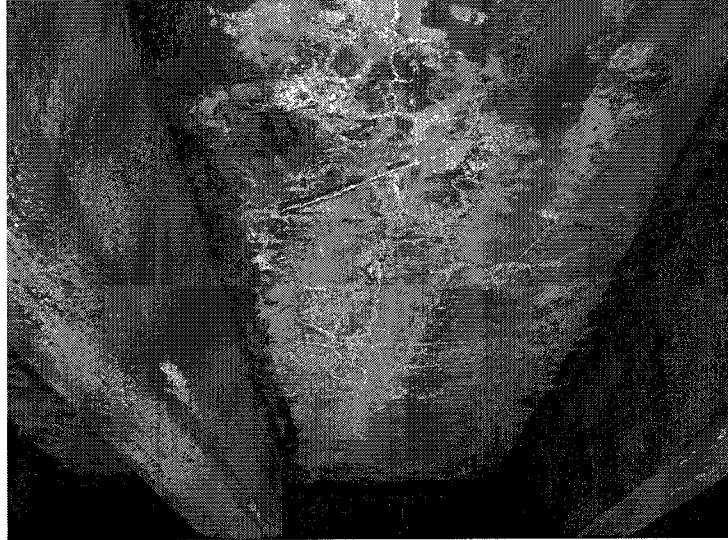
Span 1, Bay #5; Cracking in deck soffit is heavy. This section is directly below the southernmost steel plate on the deck surface.
